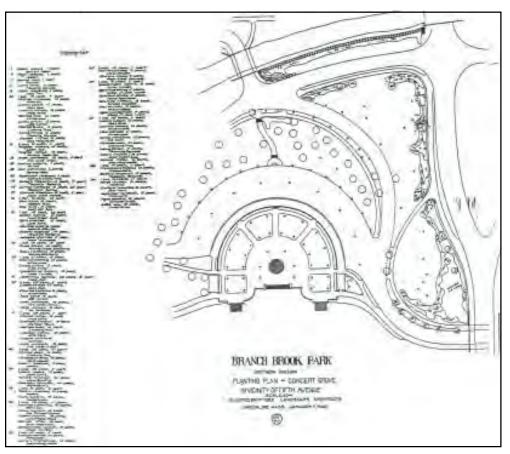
Planting Plan for Concert Grove, Plan #2121-576, January 1902. Source: ONHS
